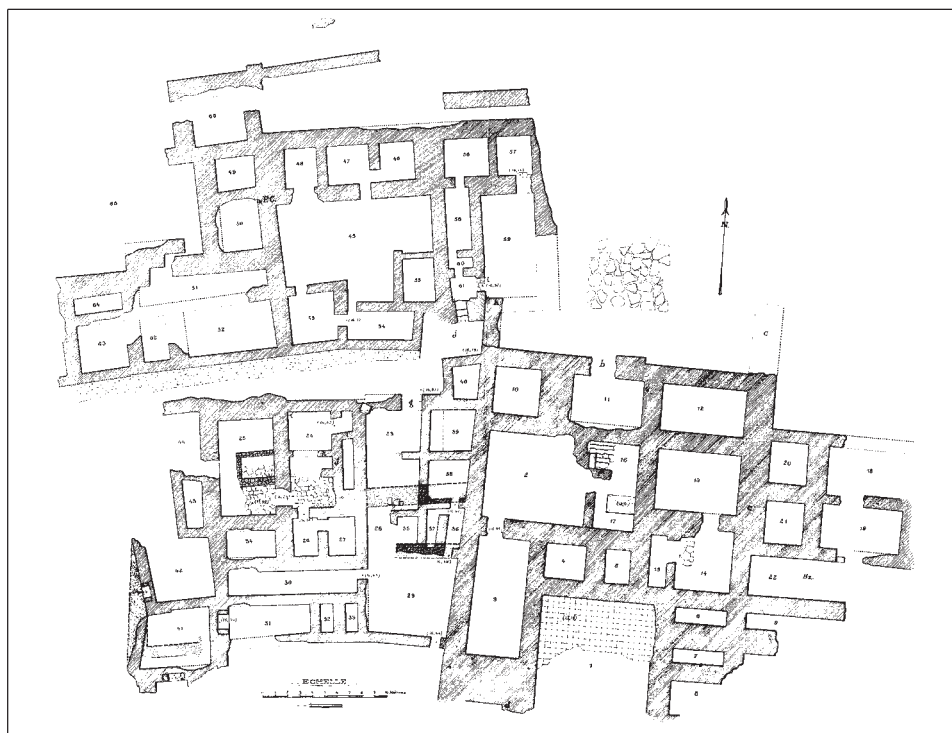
Plan of "Le Niveau Araméen" of Til Barsib (THUREAU-DANGIN, DUNAND 1936, Plan C)
